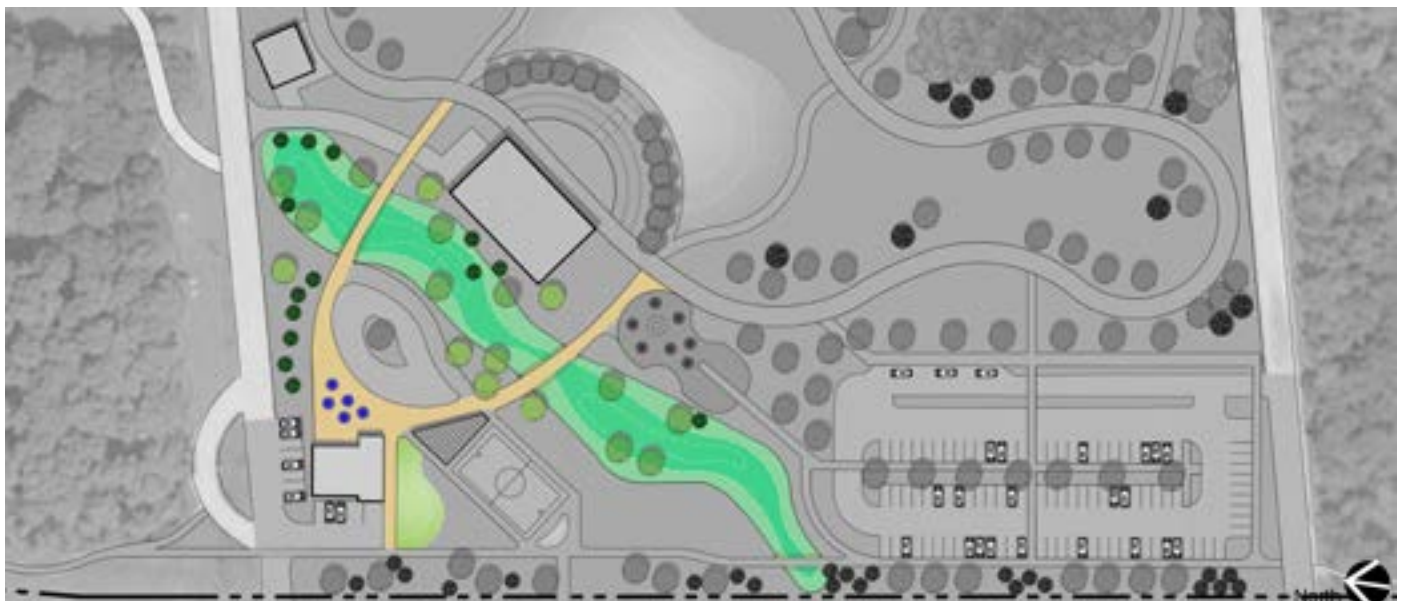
Master Plan Concept Design for Pedestrian Circulation and Drainage Improvements
